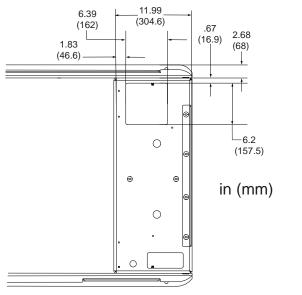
Installation Drawing Stub-Up Detail (Typical)
